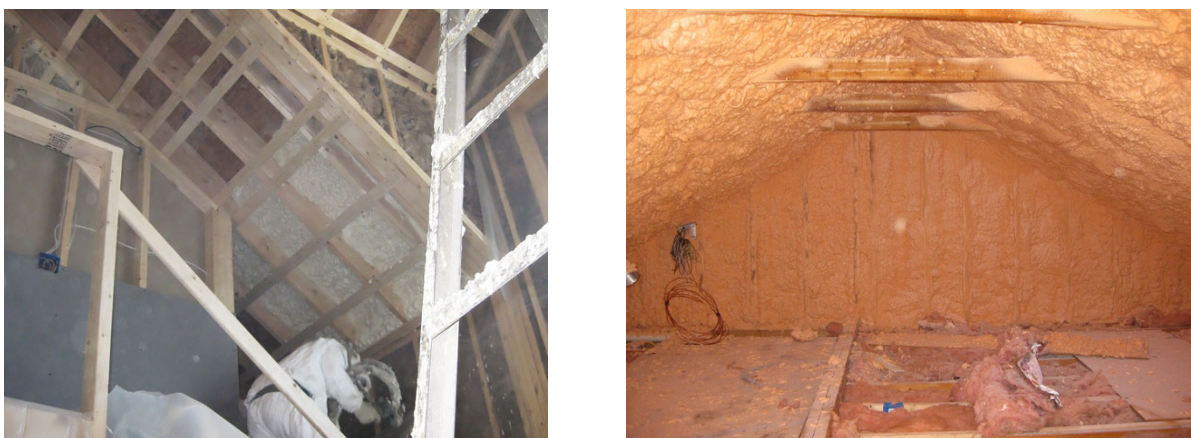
Left: SPF insulation being installed in roof framing cavities at Test Home 3. Note how roof framing precludes insulation for an appreciable portion of the roof area and that the strapping depth does not allow much depth for insulation over the framing; Right: roof rafters fully embedded in spray foam insulation at Test Home 1.
